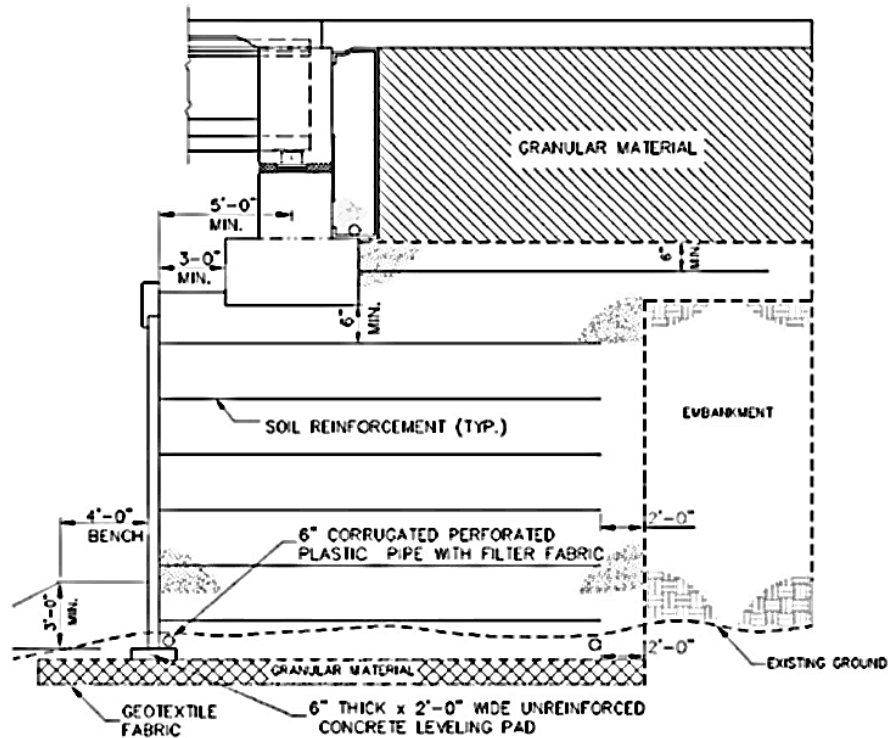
MSE wall system supporting bridge abutment (Tarawneh and Siddiqi, 2014)
